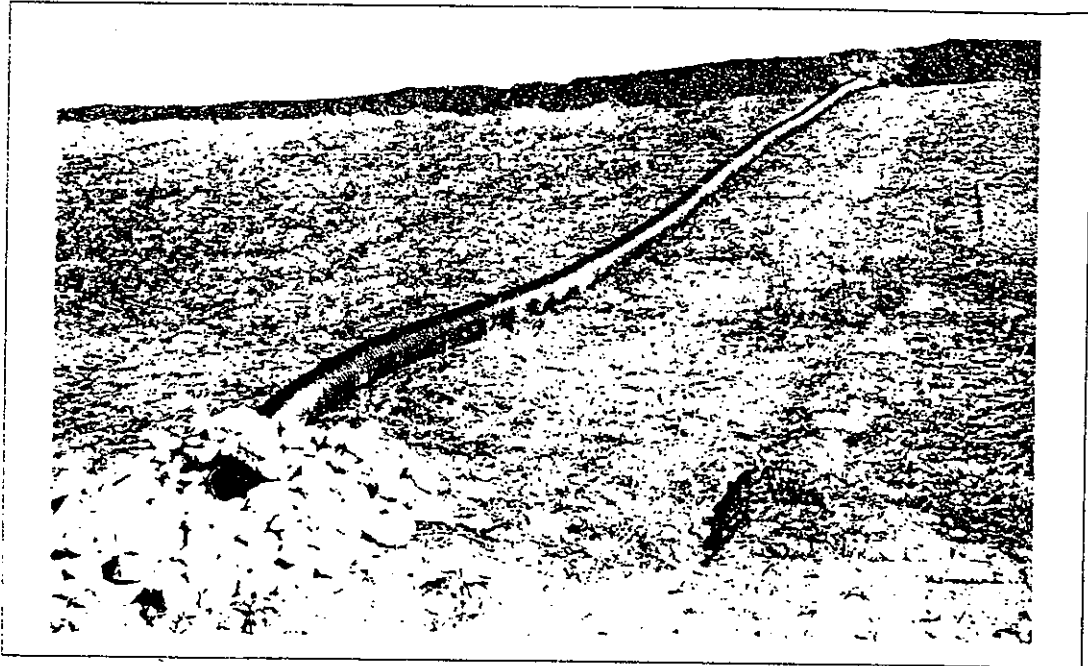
A. A temporary slope drain conveys runoff to a lower elevation without eroding the slope of this landfill. The pipe should be anchored with stakes to prevent it from moving.
